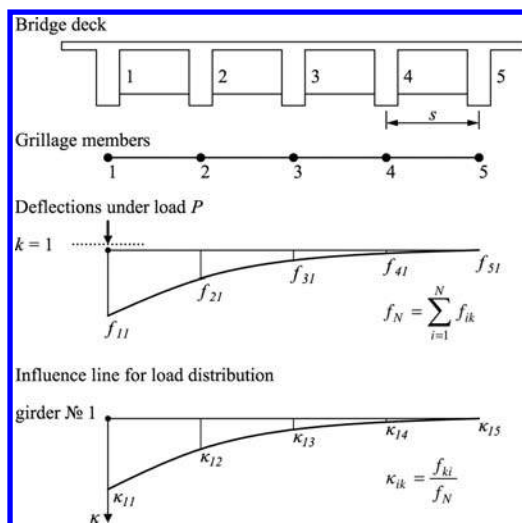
Five-girder bridge: cross section, grillage members, deflections due to force at external girder and load distribution graph for external girder (No 1).
